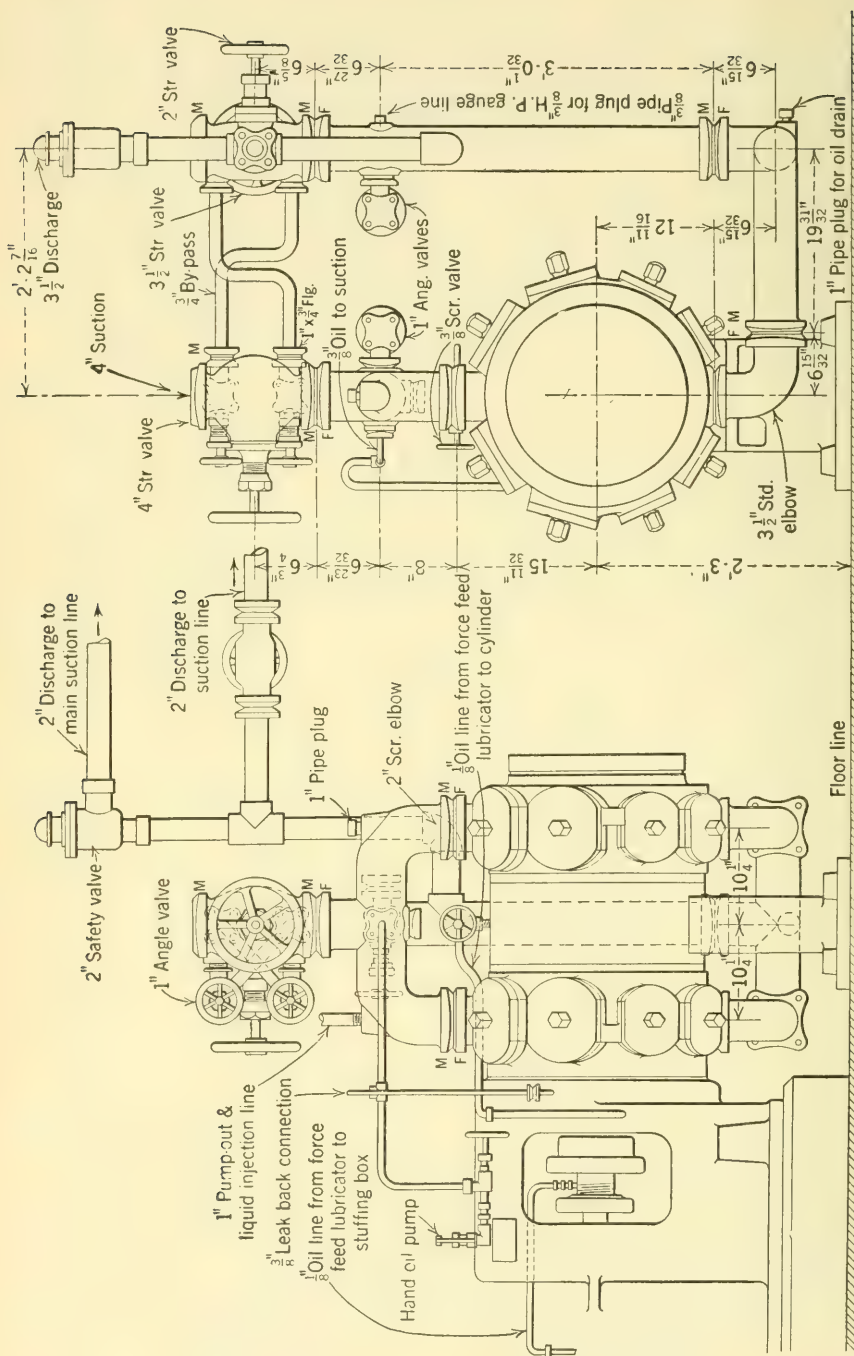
Piping—The Horizontal Double Acting Compressor.
